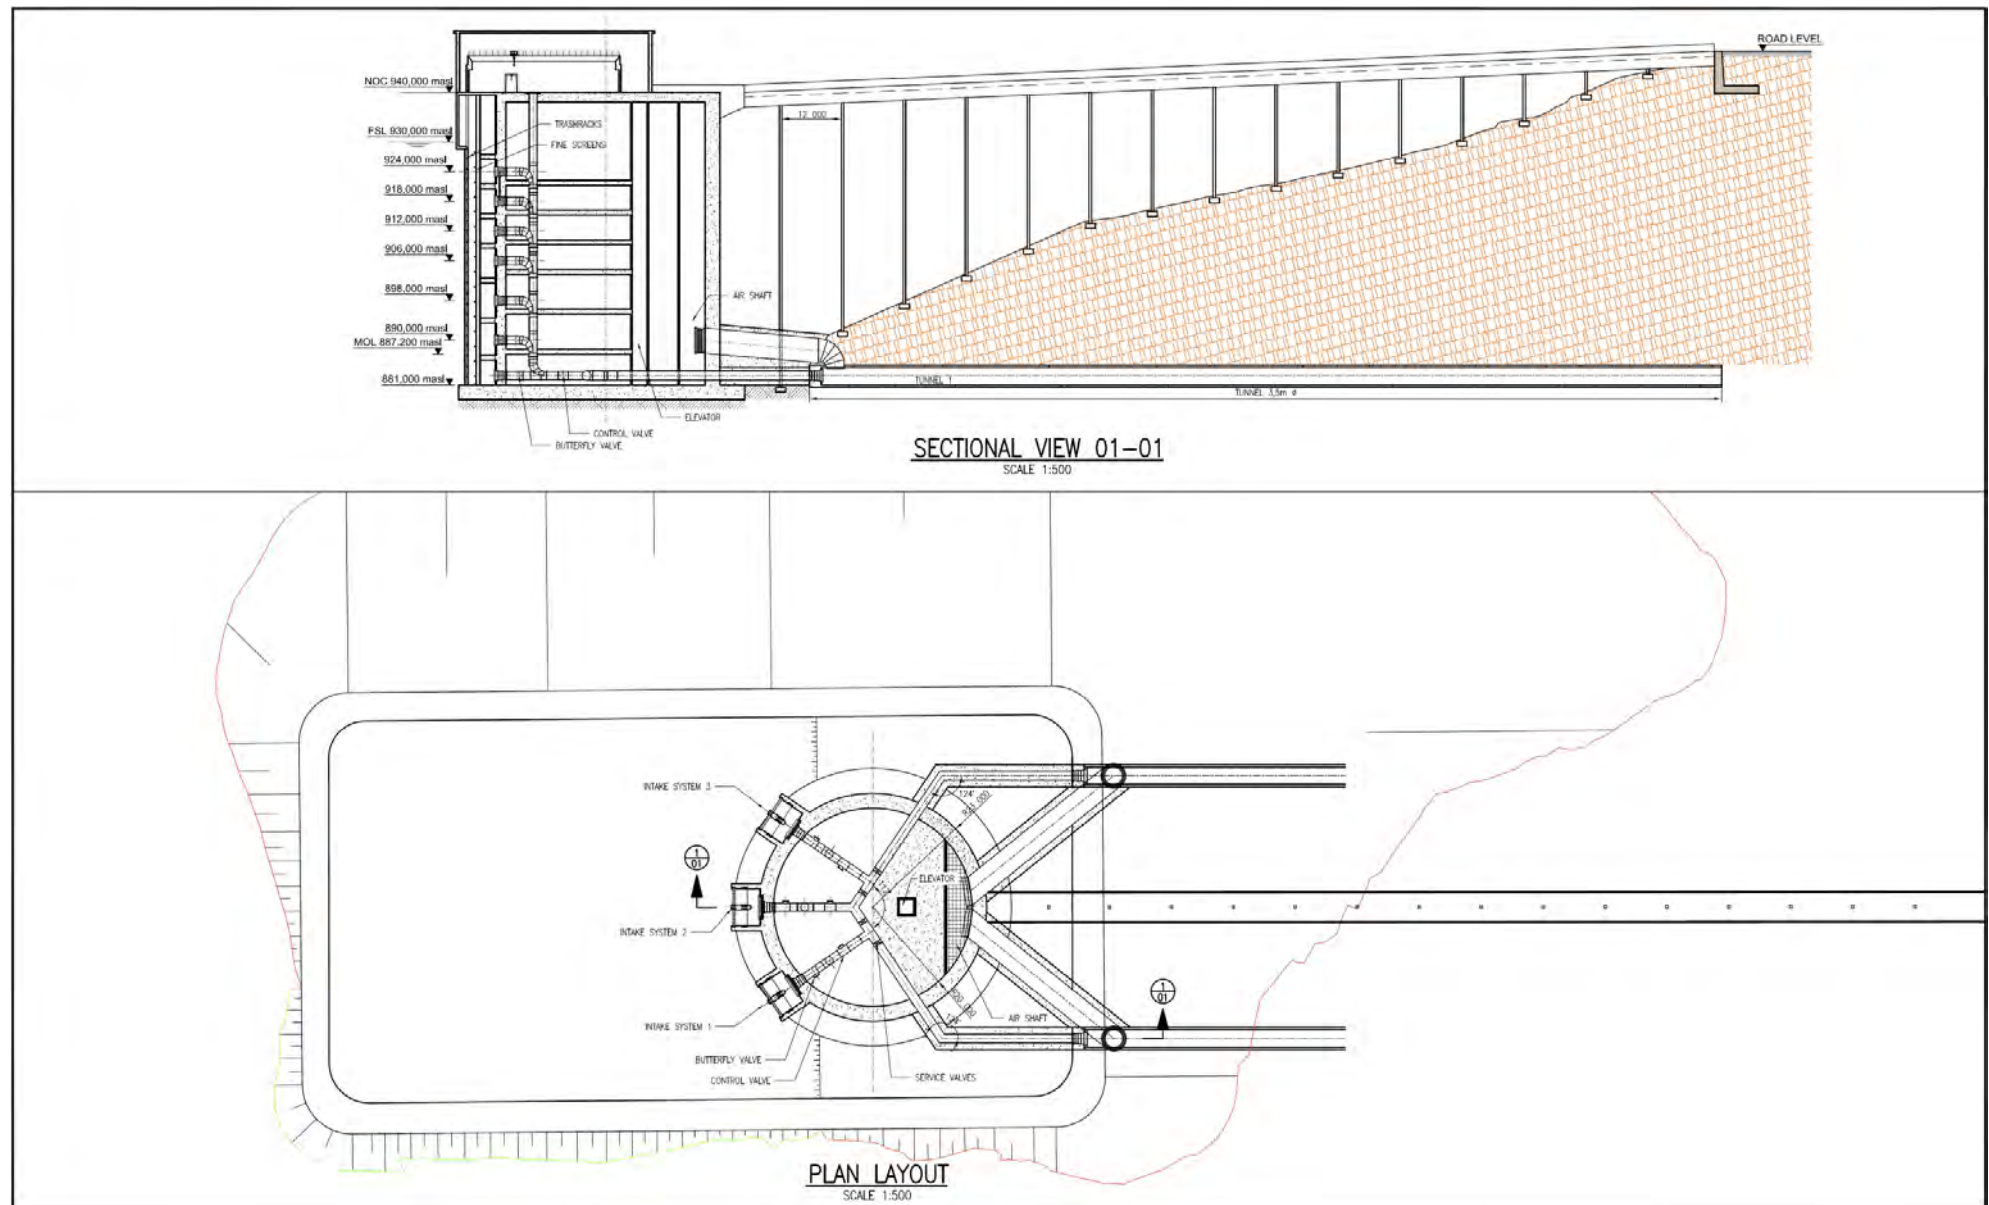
Section and Layout of the Proposed Tunnel Intake Structure at the Proposed Smithfield Dam
